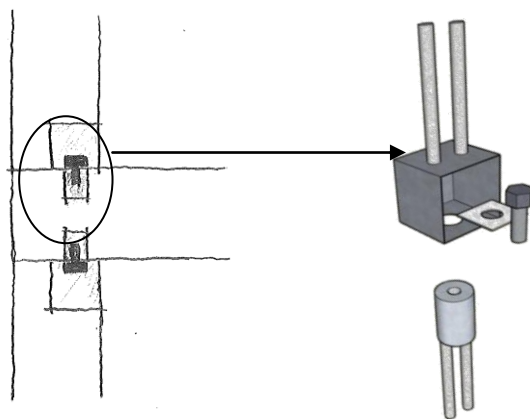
Sketch of floor-to-wall connection. Visualised when cast in and the device only.
